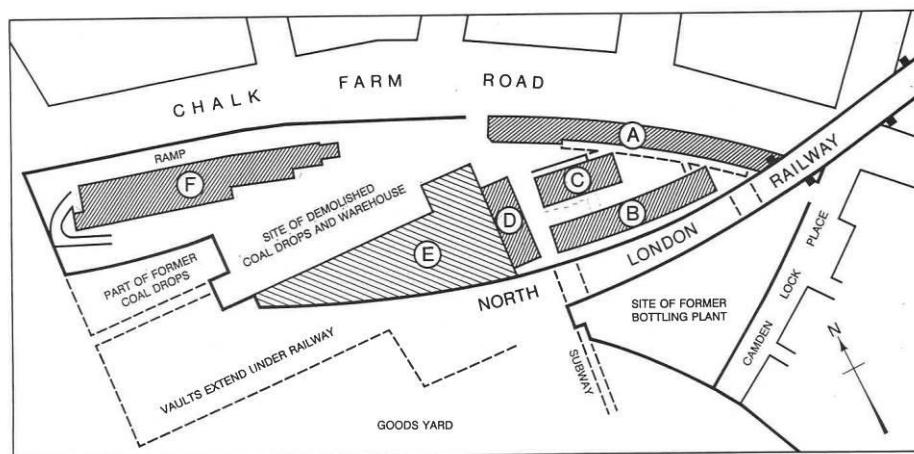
The Stables Market – Plan identifying the six buildings. The subject Building is F (from the Royal Commission on the Historical Monuments of England, Historic Building Report, September 1995).
